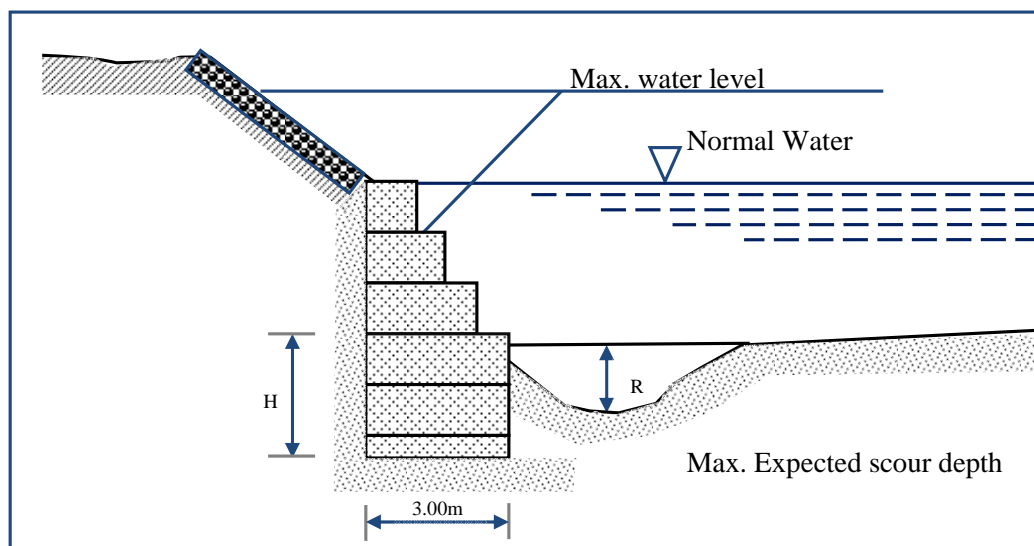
Reno mattress and gabion wall structure with deep foundation
